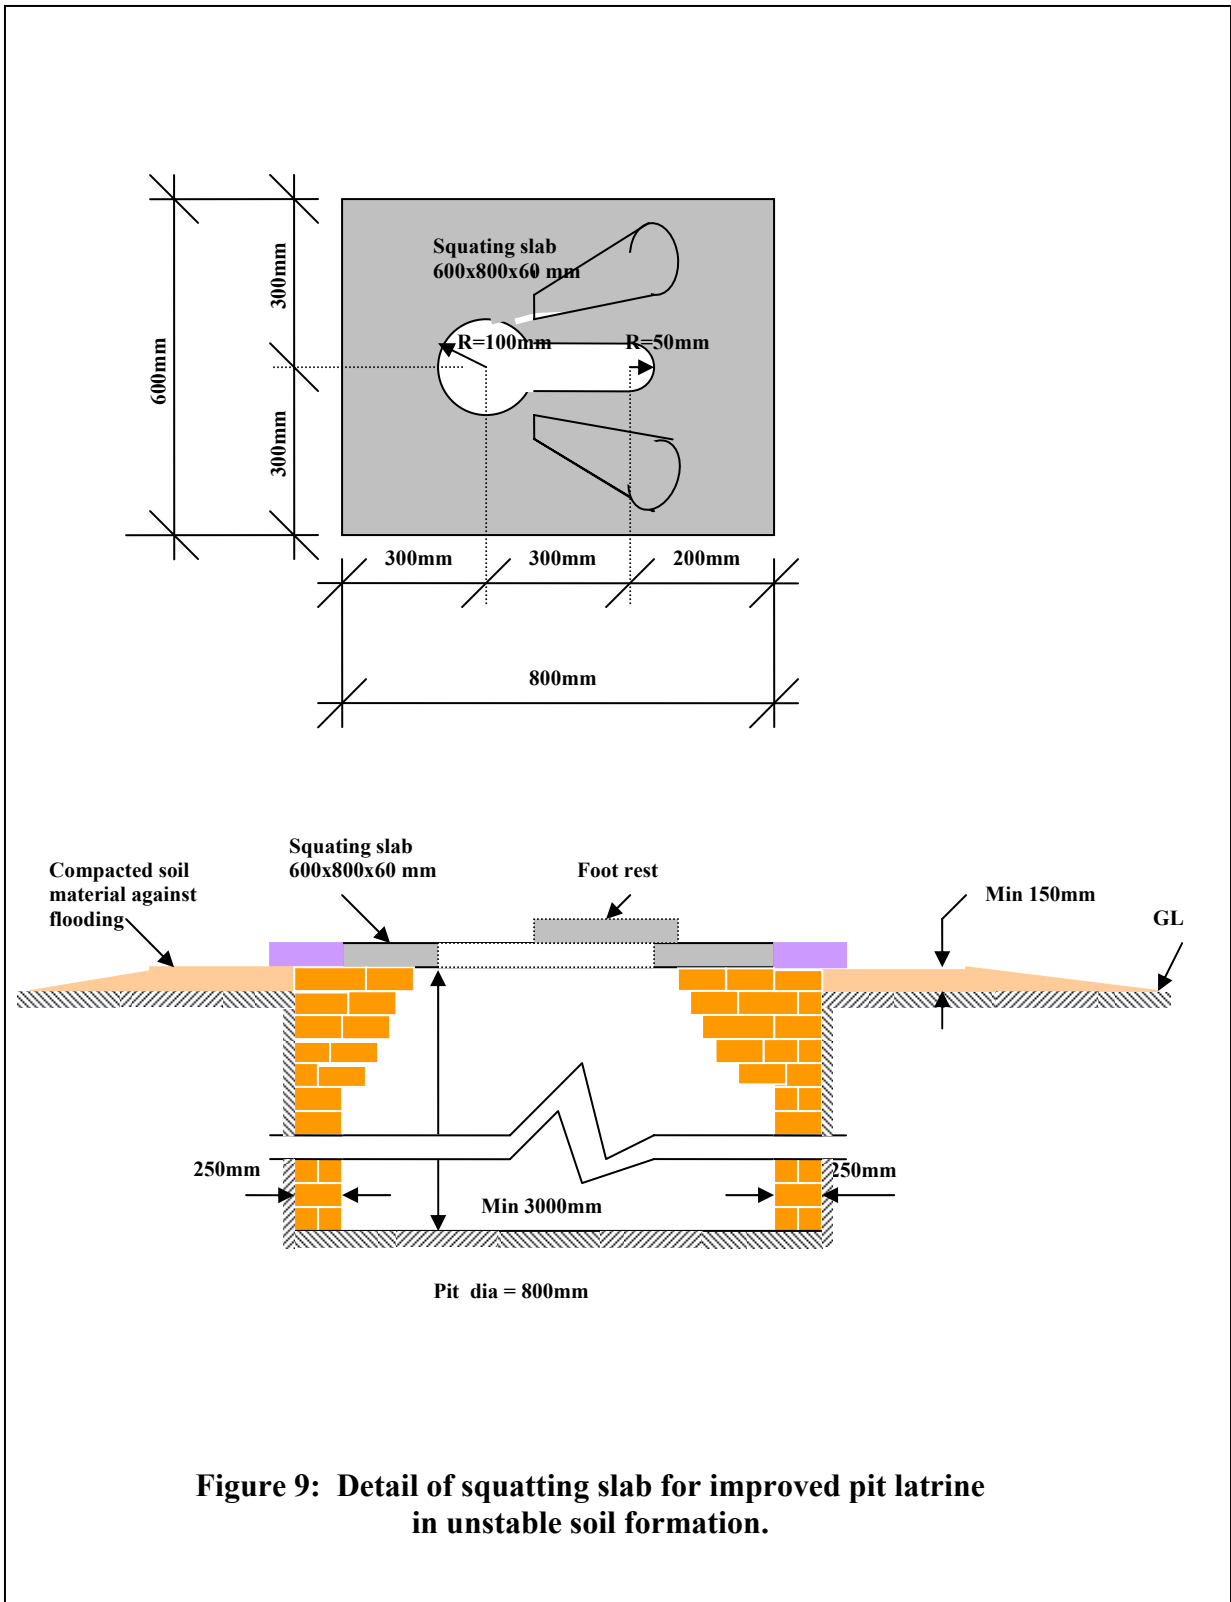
Detail of squatting slab for improved pit latrine in unstable soil formation.
